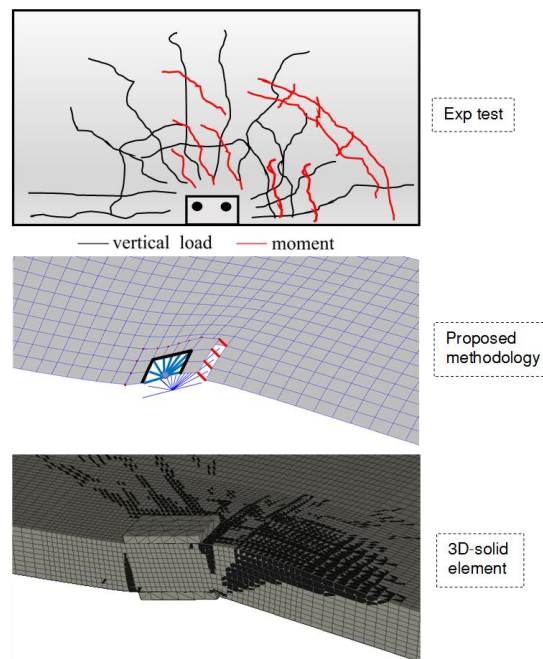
Deformed shape and crack pattern at failure of specimen PD4 (crack pattern from experimental test is adapted from Drakatos et al., 2016).
